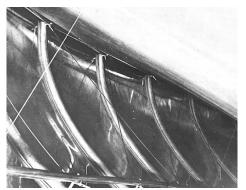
"Hat-sectioned" ribs which acted as roof support and gutters (Source: Marks 135)
